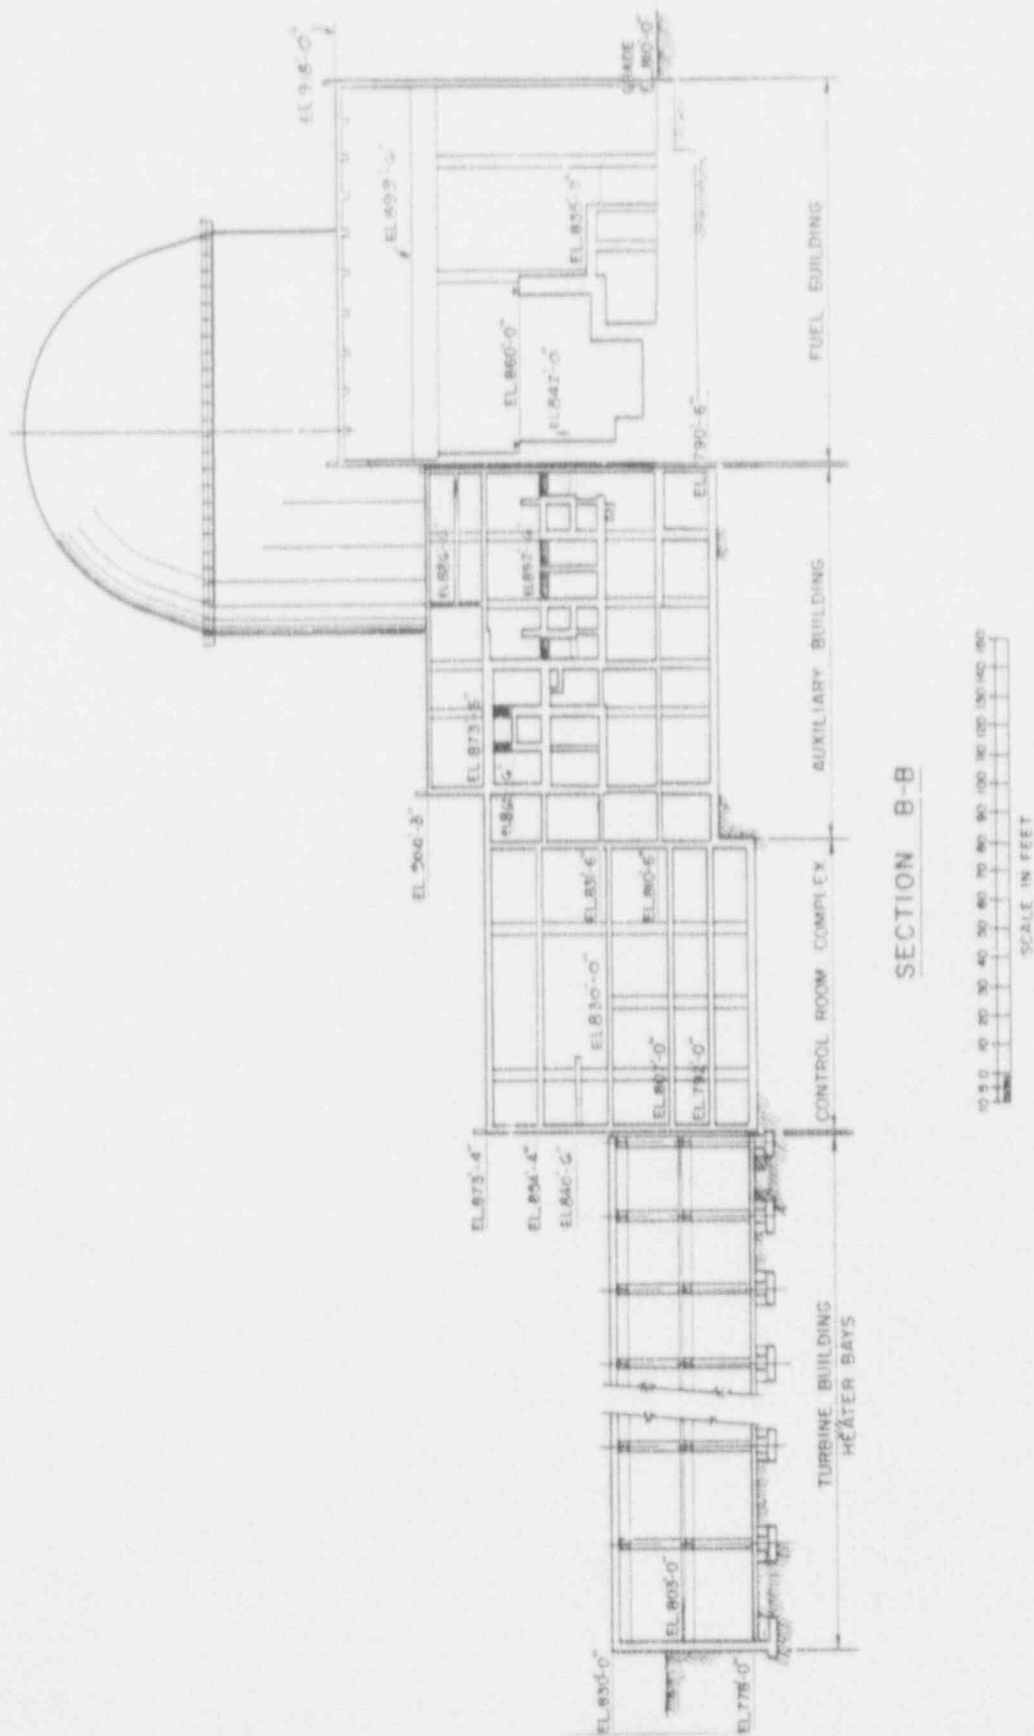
Structural Plant Arrangement (Section B-B)
